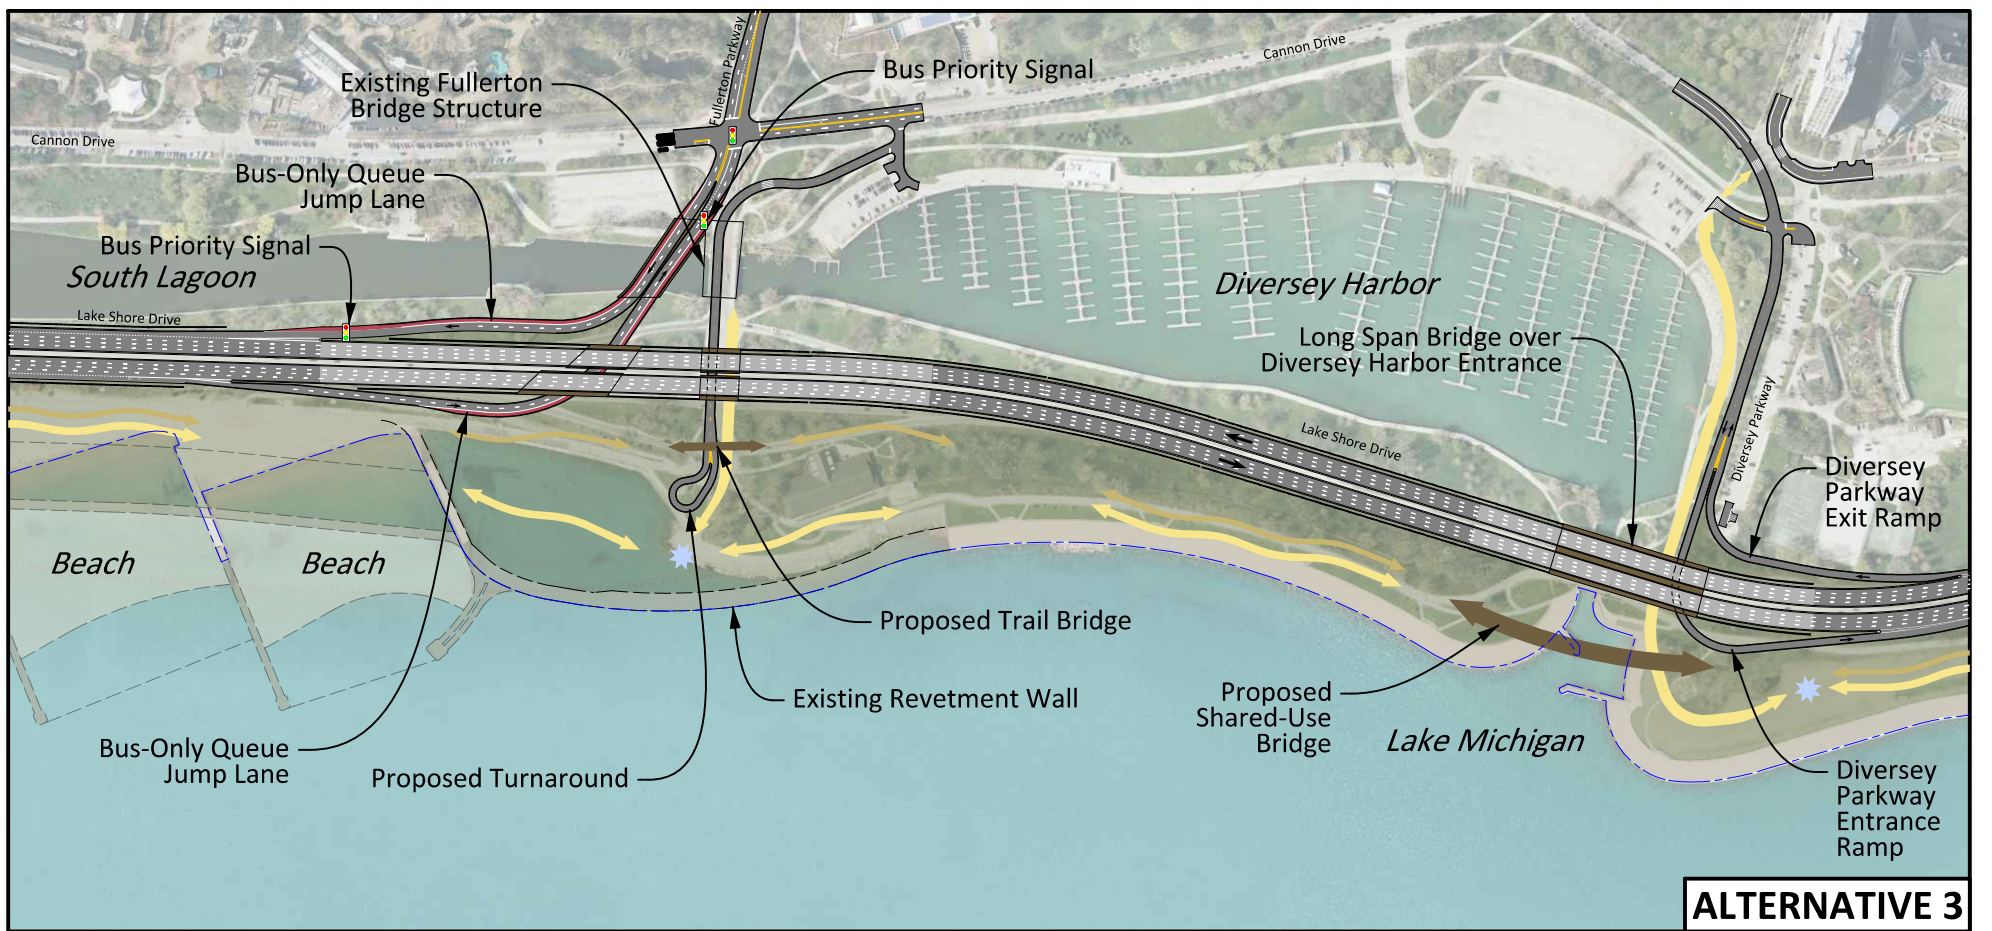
Fullerton Parkway Junction Alternatives
